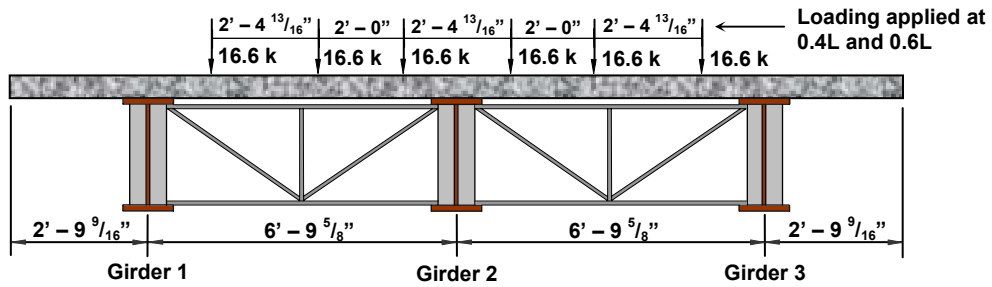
Transverse load positions for AISI-FHWA bridge
